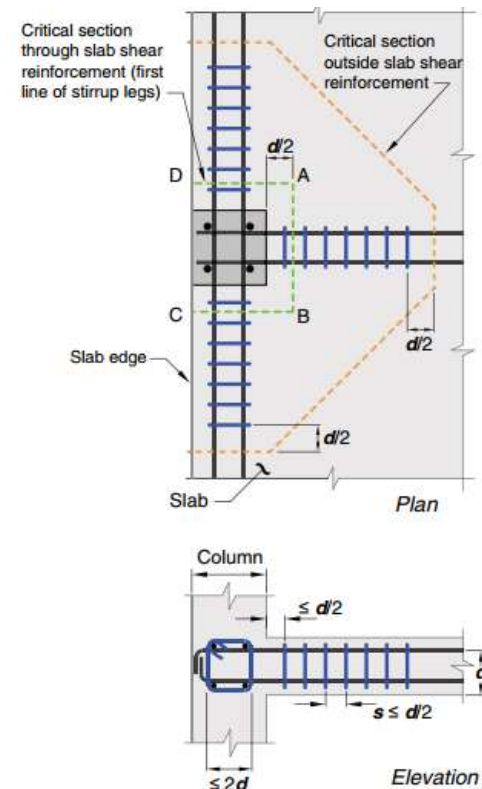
(e)—Arrangement of stirrup shear reinforcement, edge column.
